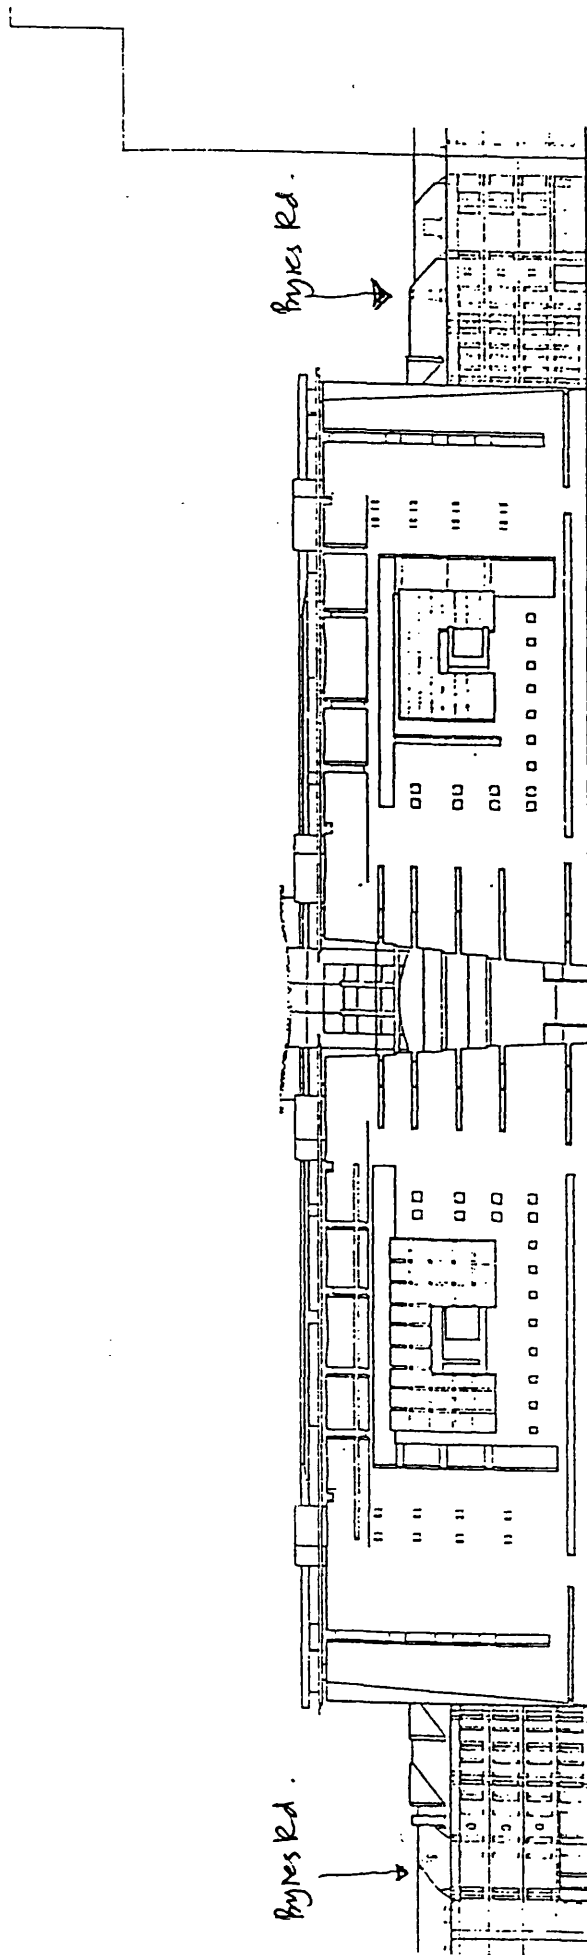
(d) : ELEVATIONS FRONTING UNIVERITY AVENUE
